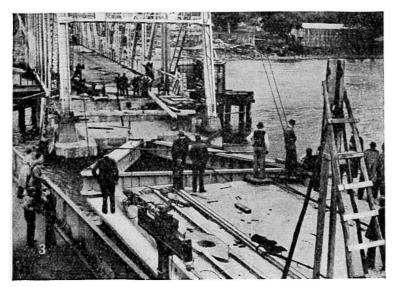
View of the three-leg link of welded plate girder design.
